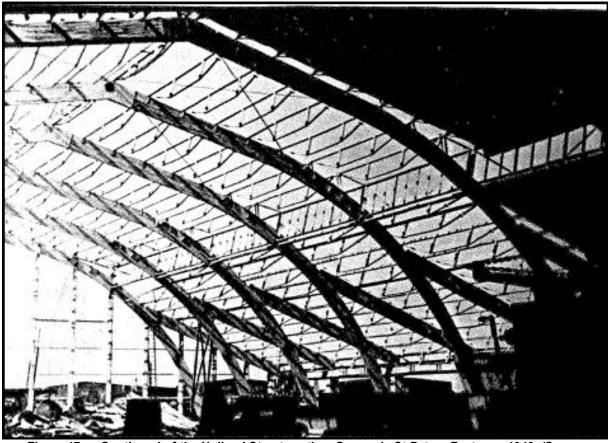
South end of the Holland Street section, Symonds St Peters Factory, c1946. (Source: Nolan, 1994).
